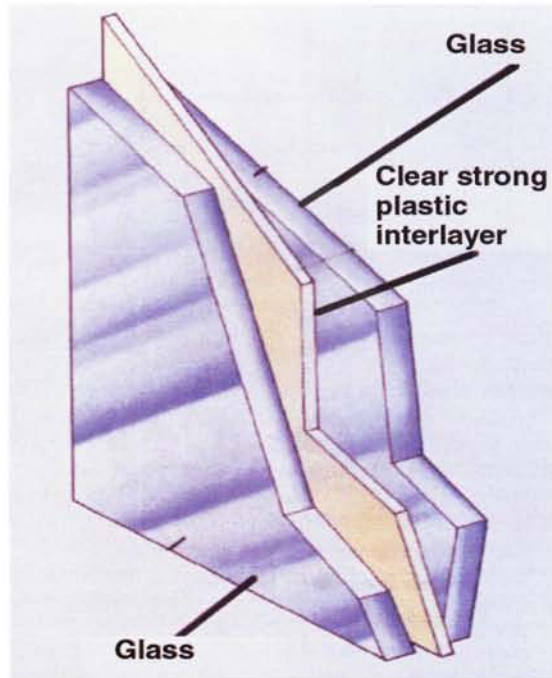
The manufacture of a laminate (courtesy of Laminated Glass Information Centre)
